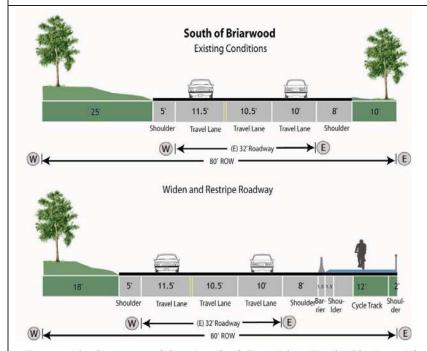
Conceptual Section 3.1b5 - Widen Trail 10' (E), Widen Roadway 7' (W), Restripe 70'
